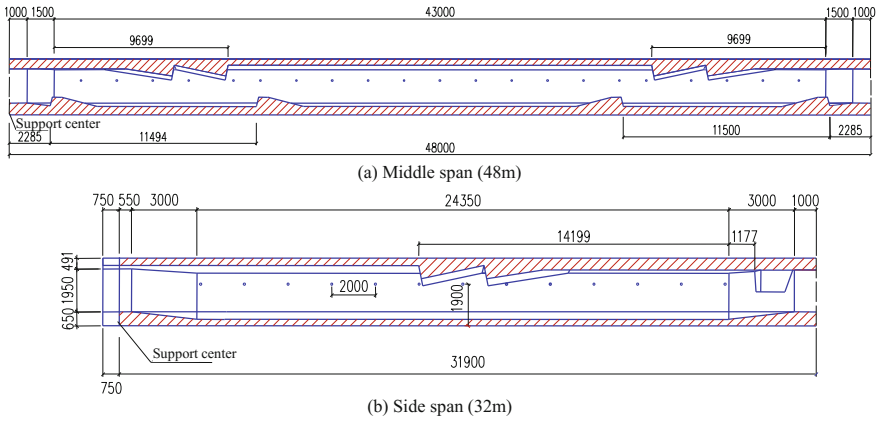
Elevations of the (32+48+32) m continuous bridge (unit: mm)
